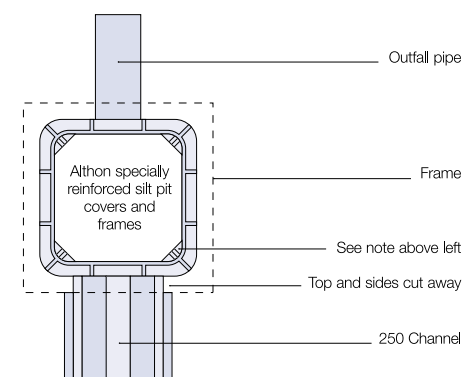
SILT PIT WITH CHANNEL AND OUTFALL PIPE
